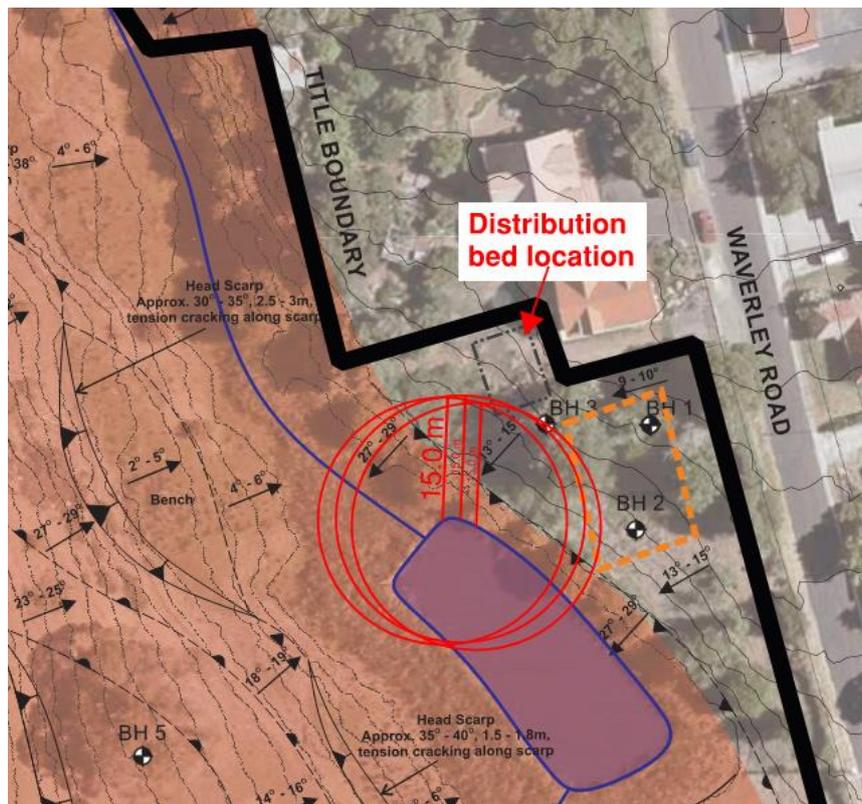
Plan showing minimal encroachment of onsite wastewater distribution beds on watercourse setback
